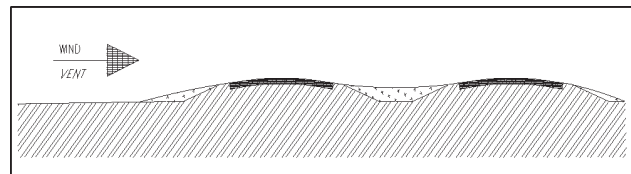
Travelled surfaces at same elevation minimize snow accumulation on roadway
